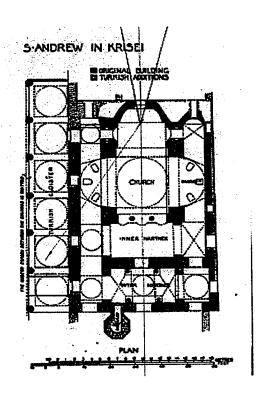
Plan St. Andrew en Krisei Istanbul
